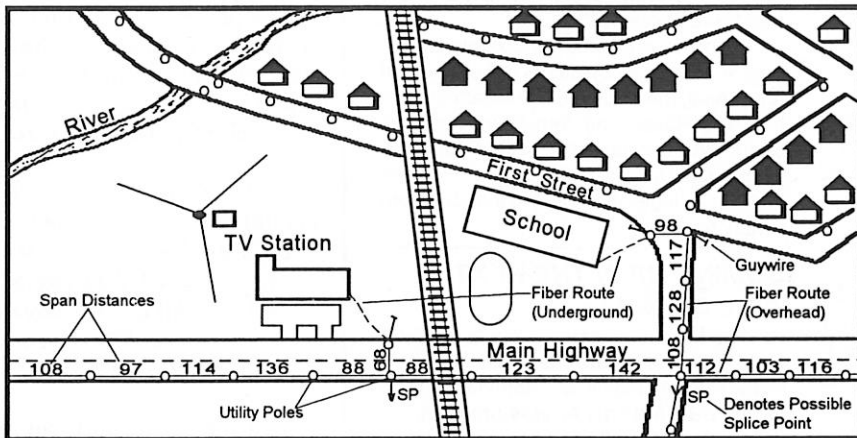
ROUTE MAP. Note the addition of: the proposed fiber cable route; utility poles necessary to support the overhead portions of the fiber; landmark buildings (TV station and school); actual curb lines where driveways and parking lots exist outside of roadway rights-of-way; other significant topographic features (tower; athletic track). Note that the fiber route, and the supporting poles, are shown inside the roadway right-of-way; only the fiber necessary to interconnect the buildings is placed outside of the right-of-way.
